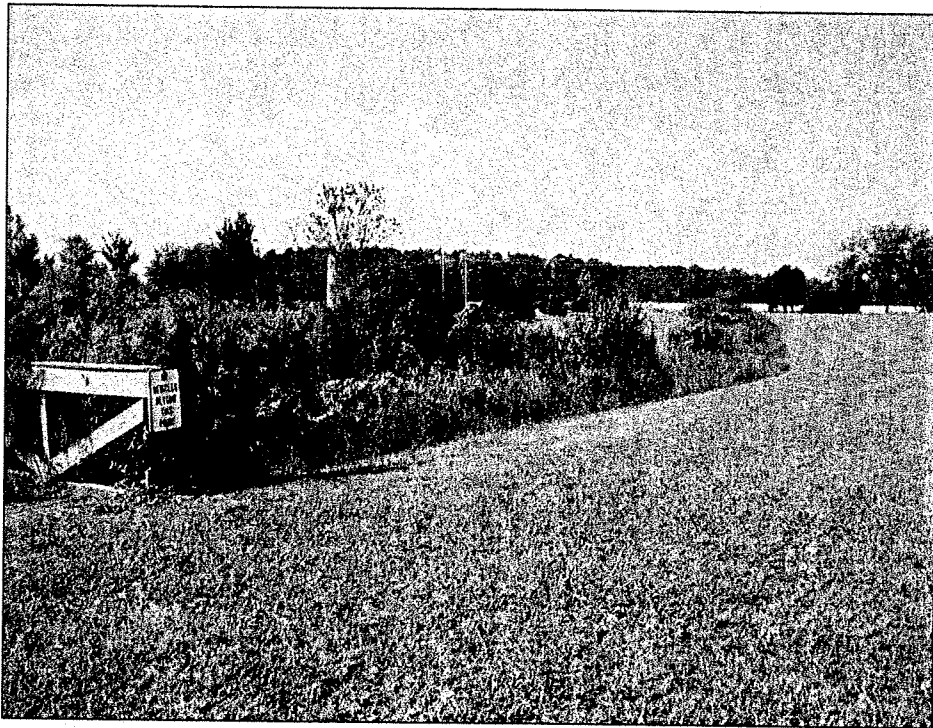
Project Site looking from existing wooden bridge towards Wayne Memorial Drive
